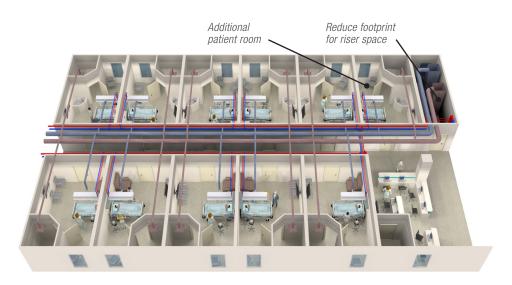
Reduced riser and mechanical room space requirements could allow for an additional patient room on each floor
